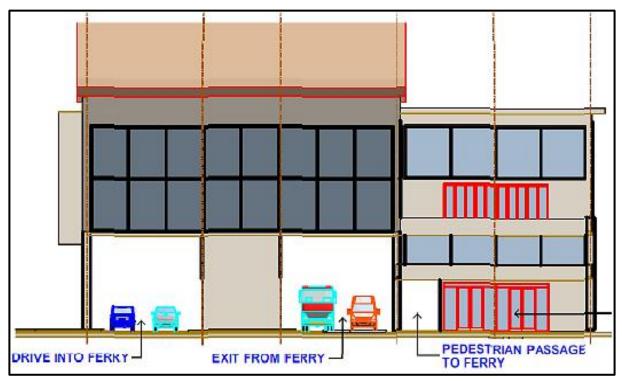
11: View of the station built over the access road to ferry (Mainland Side)
